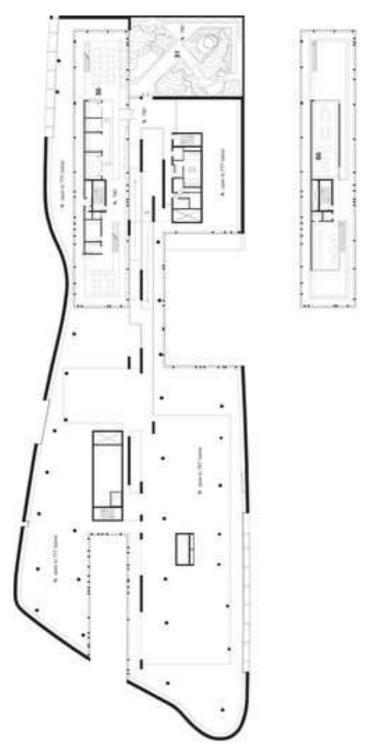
Plate LVI: Lower floor plan of Austin E. Knowlton School of Architecture
